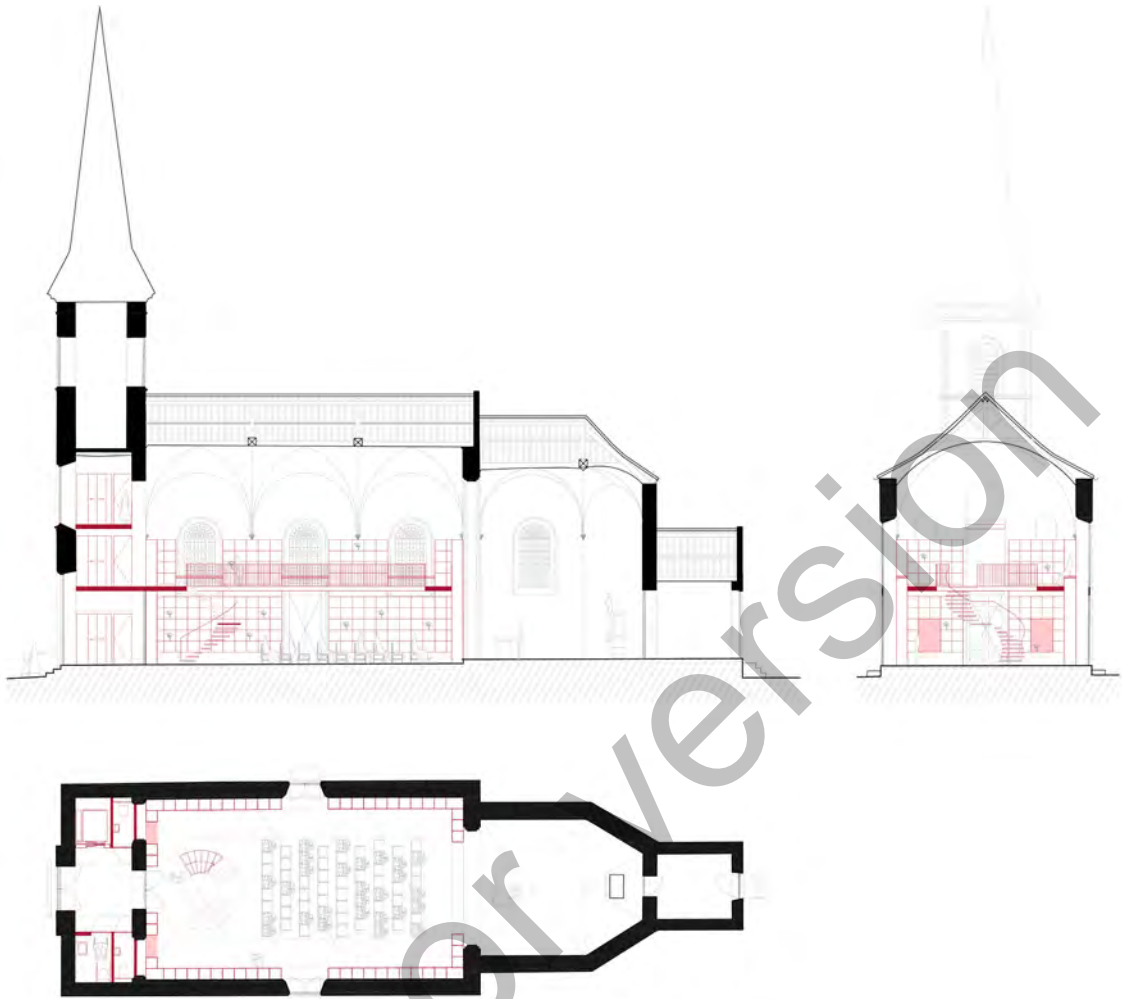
Columbarium in the Saint Odulphus church, ground floor plus longitudinal and transverse section
